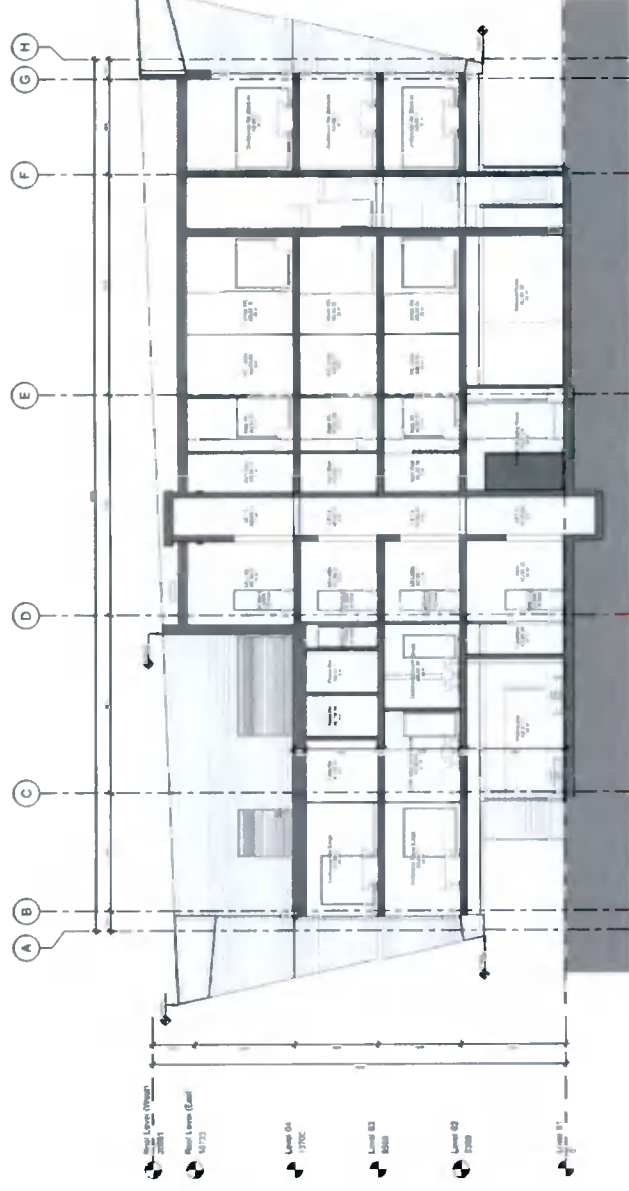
CENTRAL ADMINISTRATION BUILDING – SECTION THROUGH OFFICE ELEMENT (Image updated)
